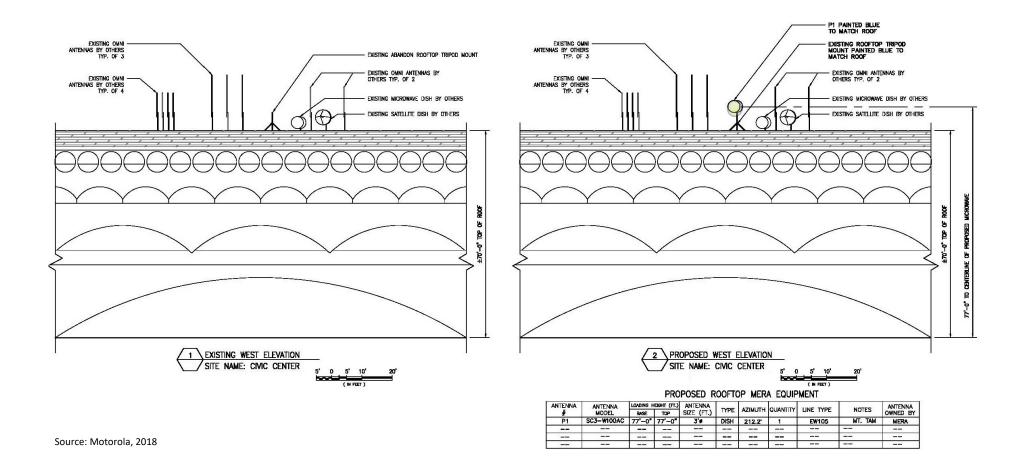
Site 2 - Civic Center Existing and Proposed Elevations
